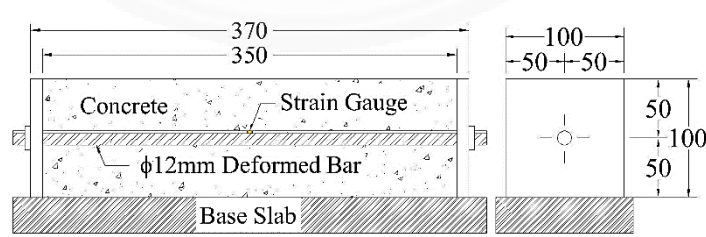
Details of restrained specimen (all dimensions are in mm)
